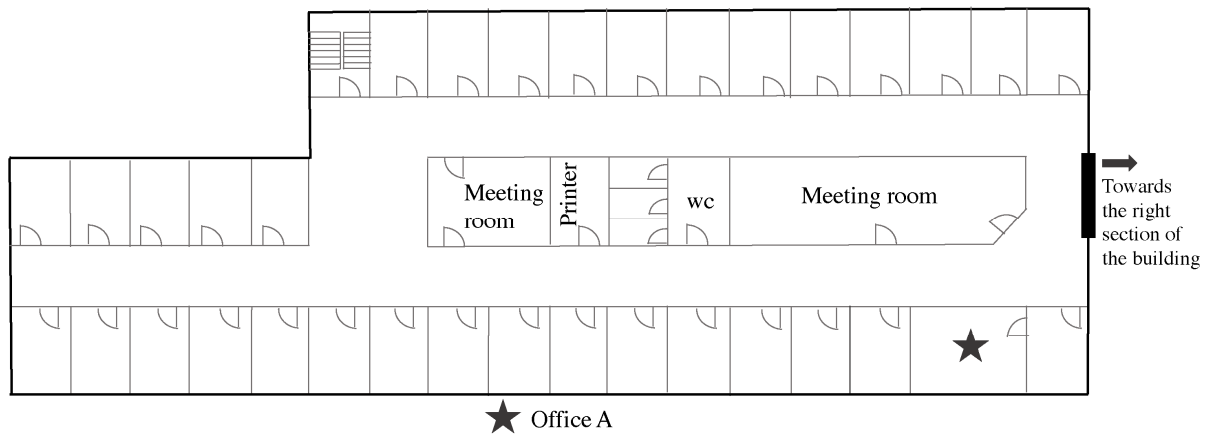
Floor plan of the left section of the building. Location of office A.
